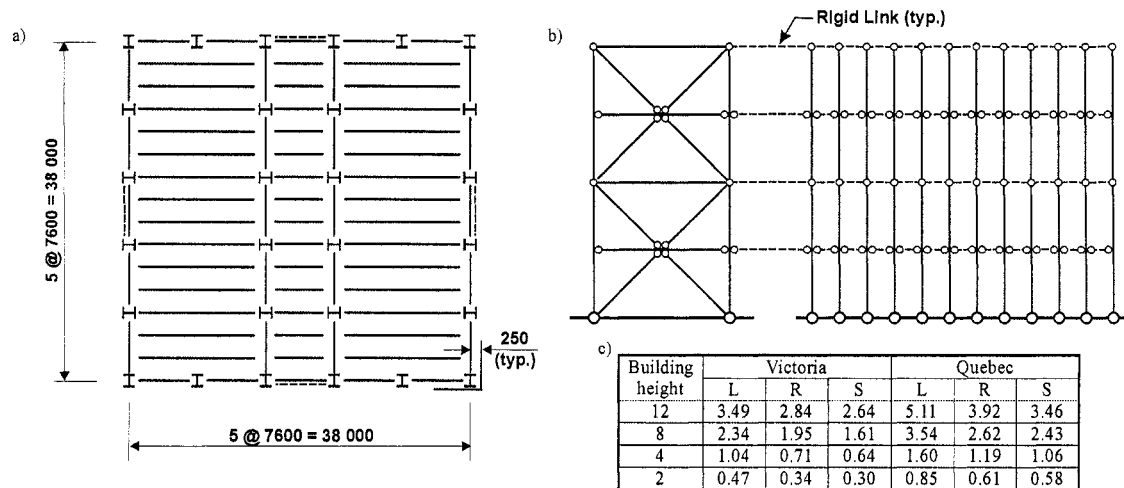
(a) Building plan view; (b) Elevation of a 4-storey frame; (c) Fundamental periods (s).
